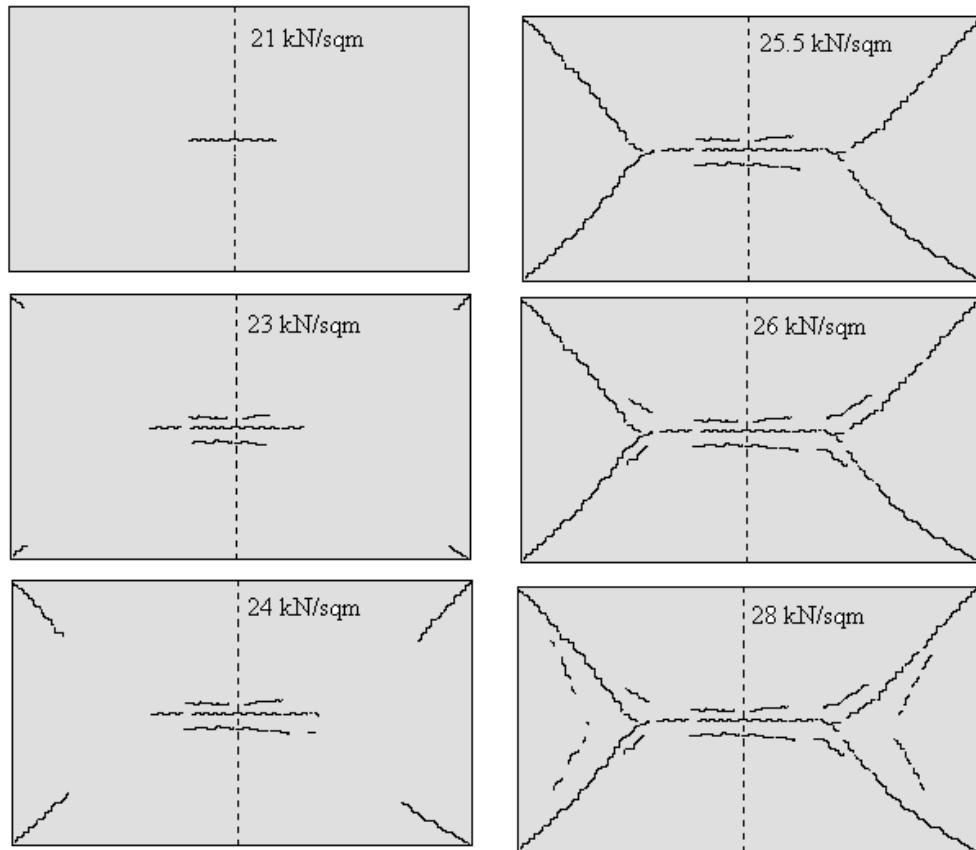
Crack Formation for slab, 2PSF with λ -value less than unity and supported over shallow internal in-built beam
